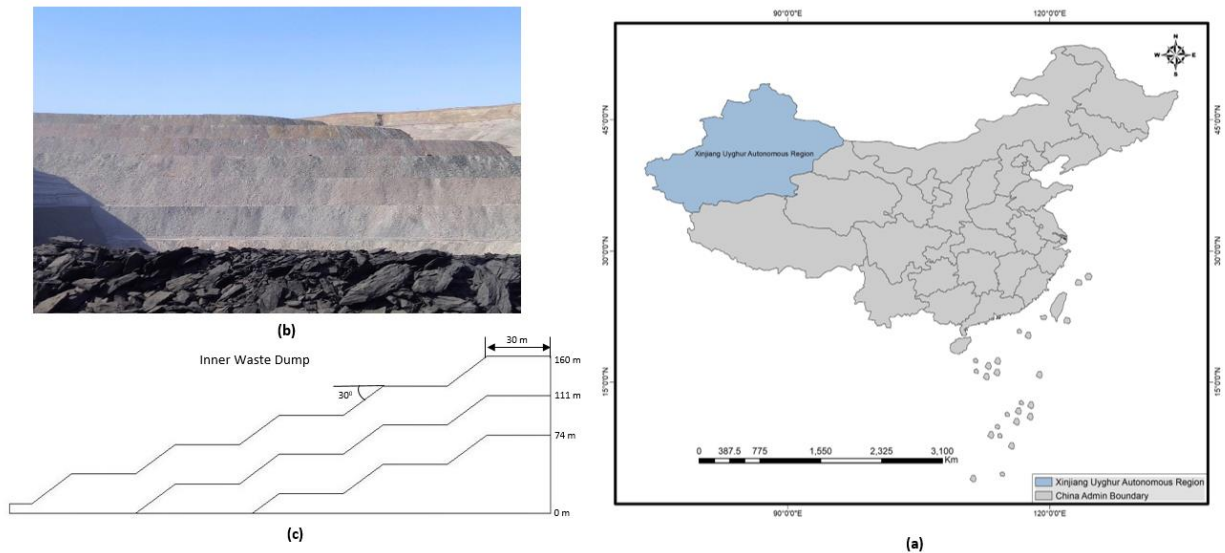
Overview and schematic diagram of south open pit dump (a) South Open Pit Mine Location (b) Mining design in March 2021 (c) section Inner waste dump
